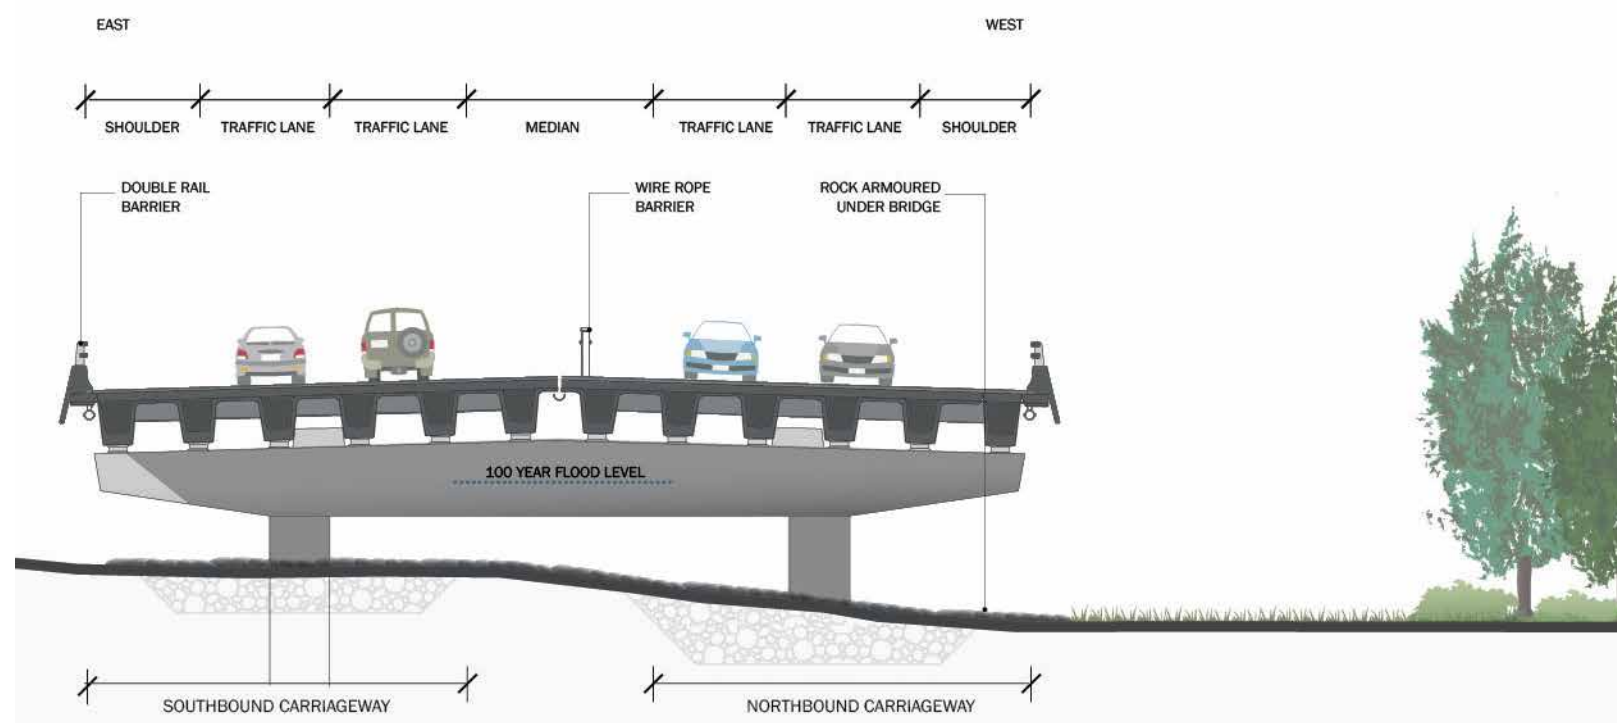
Section – Bridge SB03: Broughton Creek Bridge No. 2 (Scale: 1:200@A3)
